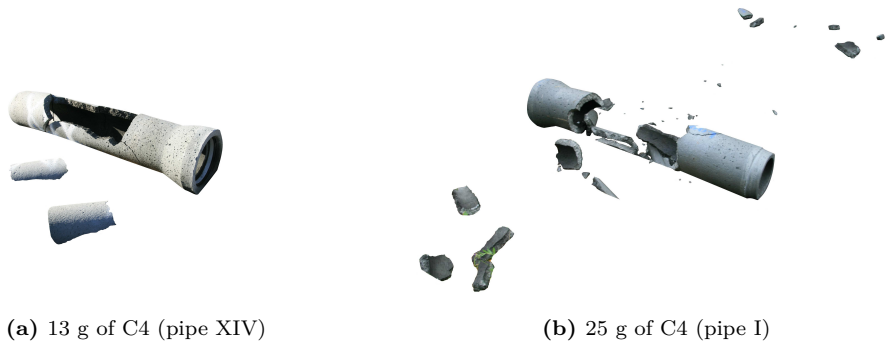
Damage of two the smaller plain concrete pipes with centrally placed charges.
